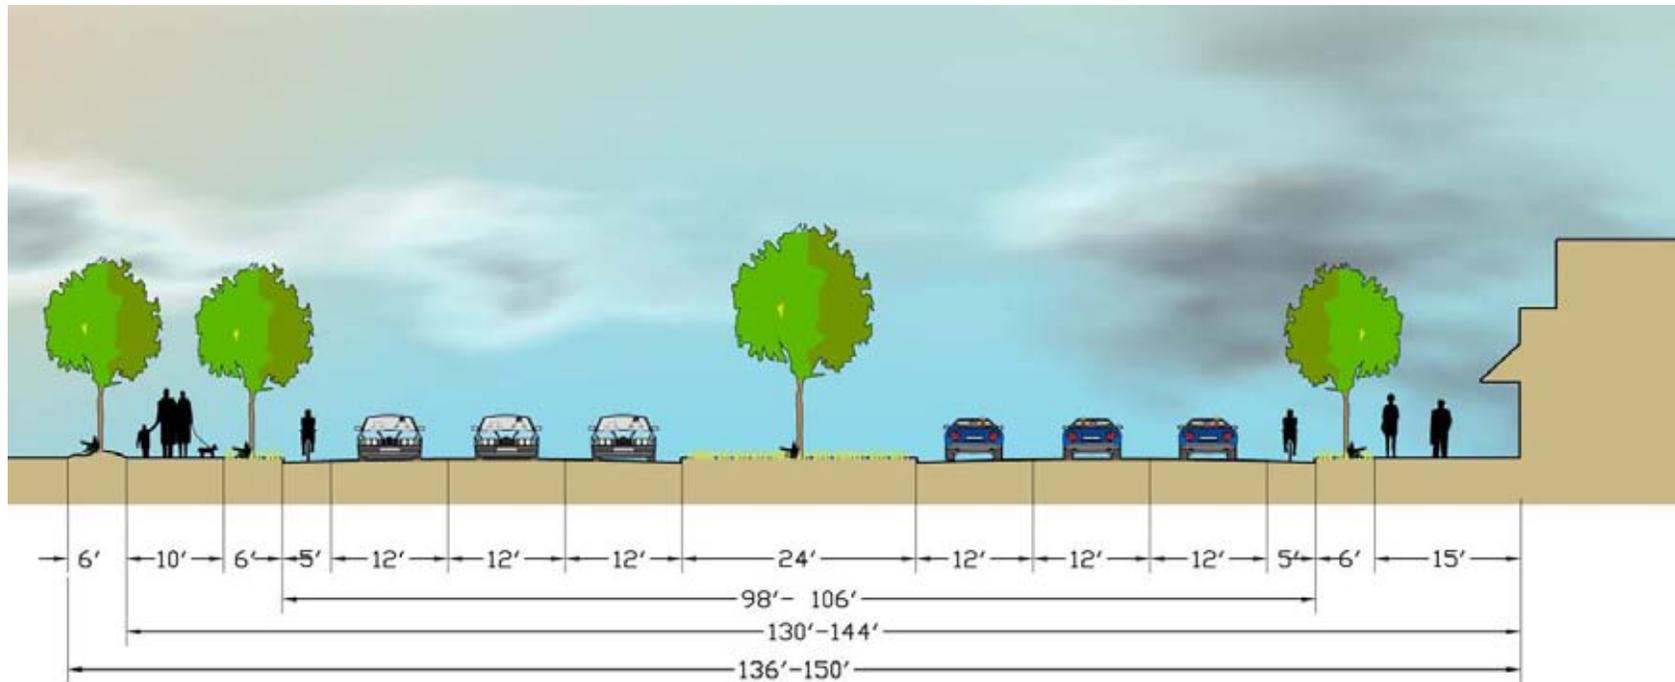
Conceptual section across Tippecanoe Avenue looking north
